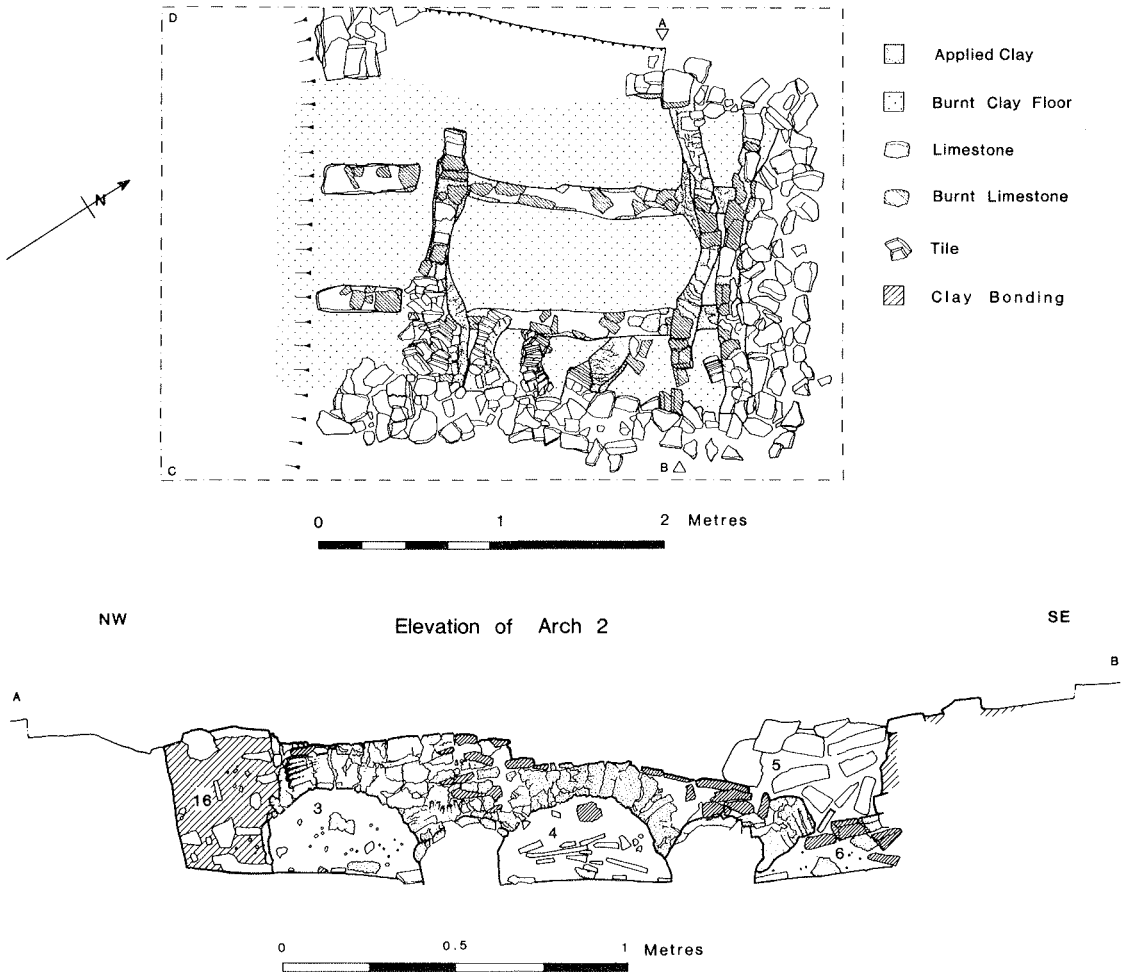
Plan of Shenley Tile Kiln and elevation of Arch 2.
